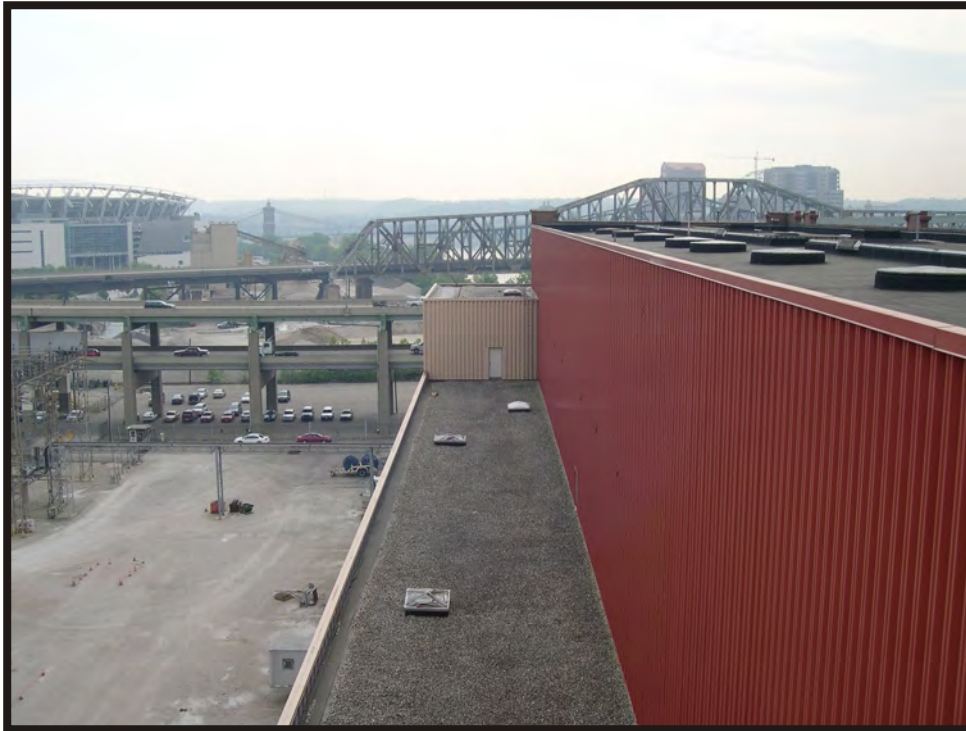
View of Brent Spence Bridge from West End Electric Generation Station (HAM-5508-43), facing east.
